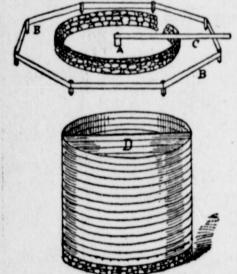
FIG. II-FOUNDATION OF ROUND SILO. ment station bulletin No. 28. The bul-
